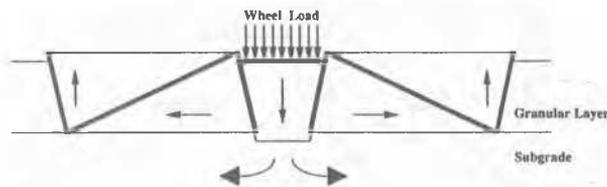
Proposed wedge mechanism for pavement foundation analysis.
